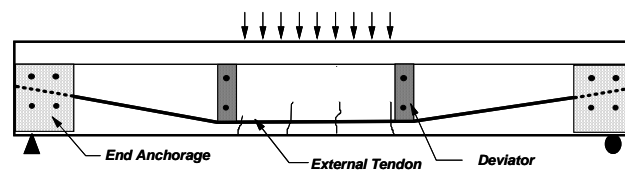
Typical layout of an externally post-tensioned box girder bridge
